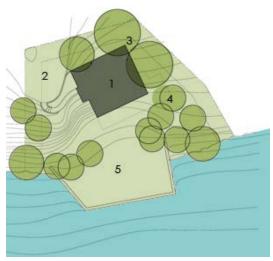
Site Plan - 1. House 2. Parking 3. Garden 4. Garden 5. Front Lawn
